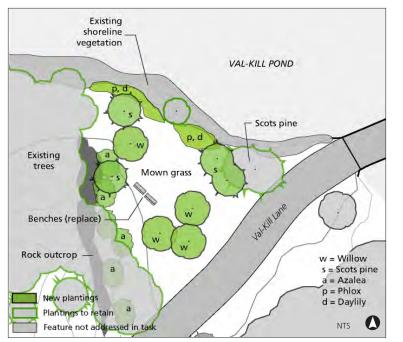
Conceptual planting plan for the southwest bank of Val-Kill Pond. (SUNY ESF)
